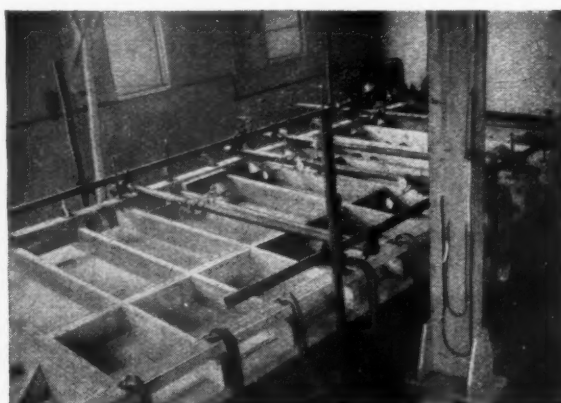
Rig for static loading tests. (Floor section is inverted, with captive airbag beneath for loading.)
